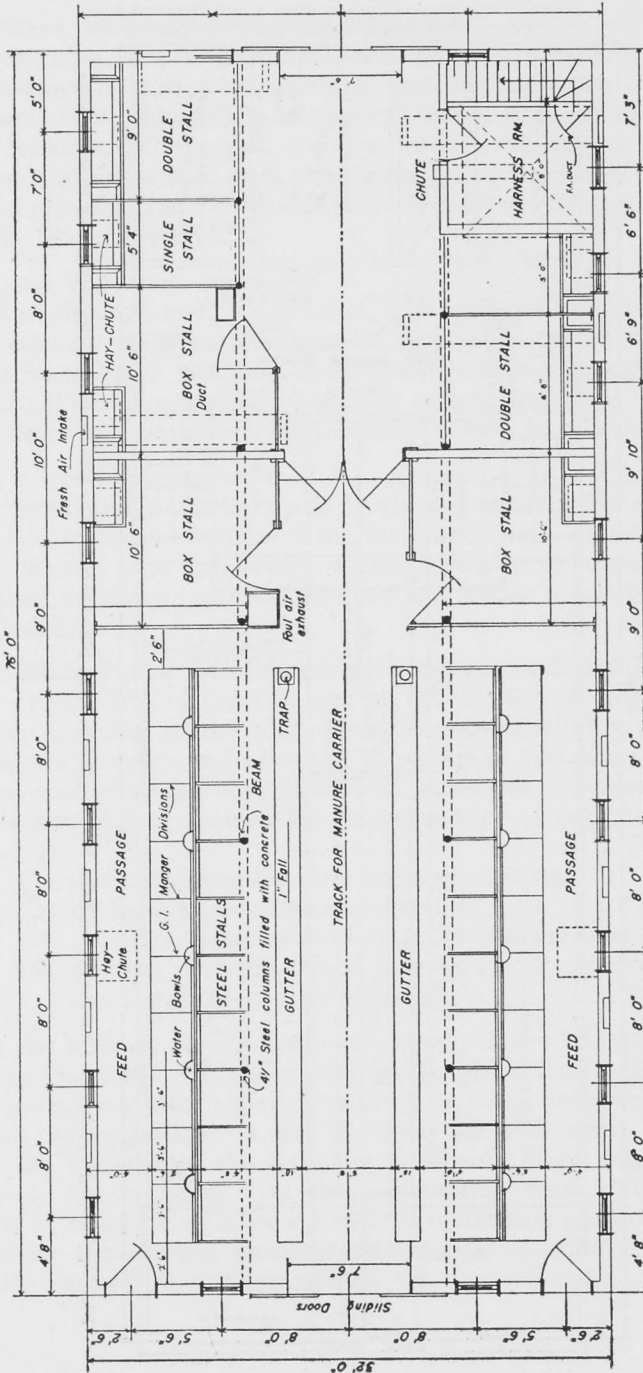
General Purpose Barn Plant. (Taken from plans prepared by the Provincial Department of Public Works.)
